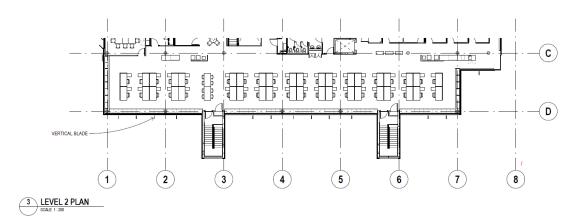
Approved Plan – Level Plan (DA 298-2016)
